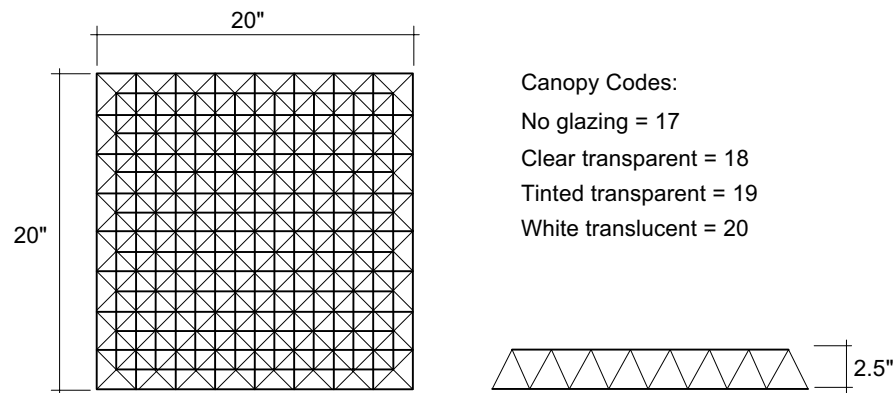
Top View and Elevation of Flat Horizontal Skylight
